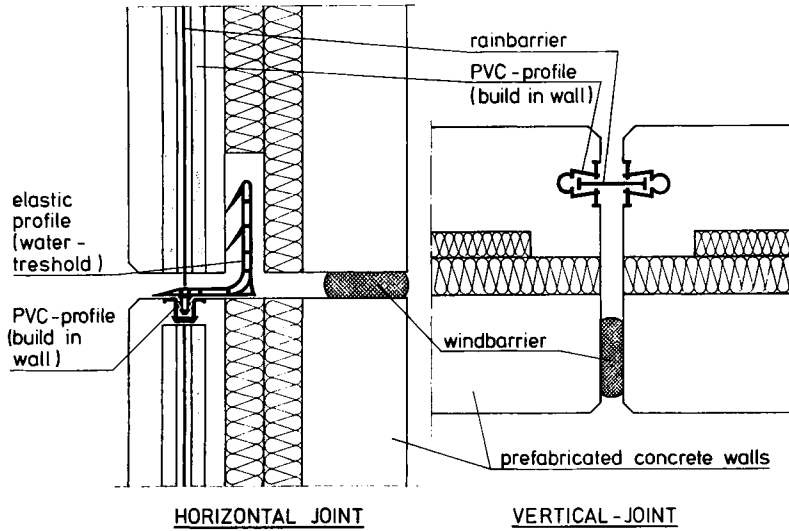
Two-stage joint in concrete sandwich wall. Plastic gaskets imbedded in wall
